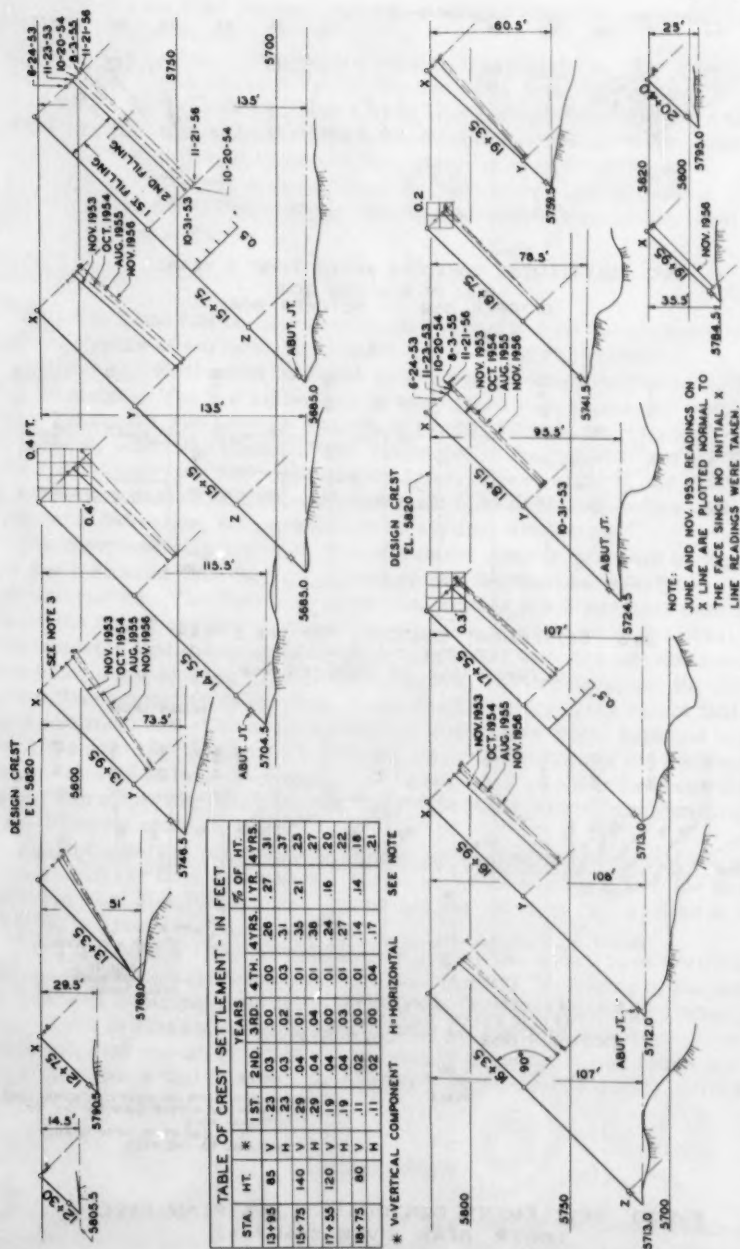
SECTIONS OF DAM AND TABLE SHOWING SETTLEMENT - LOWER BEAR RIVER DAM NO.2
